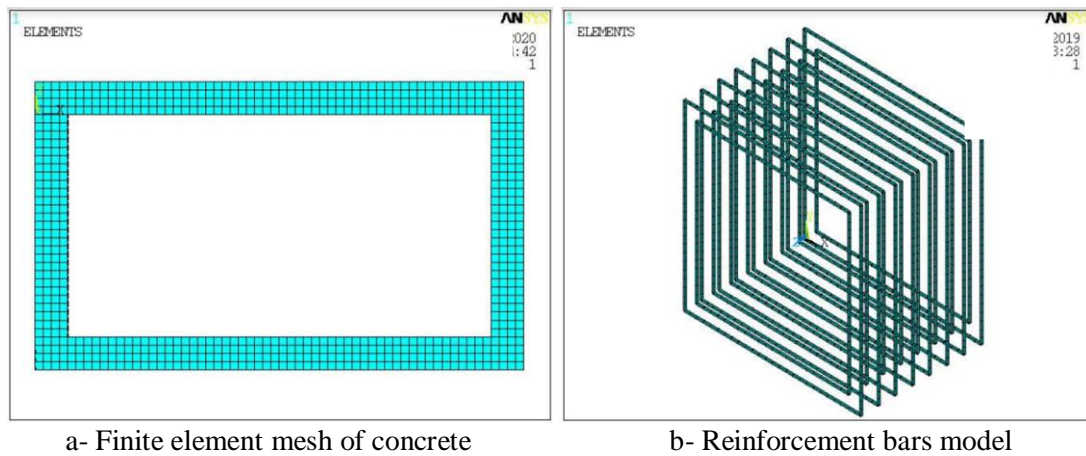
Finite element mesh of concrete and steel bars of the culvert
